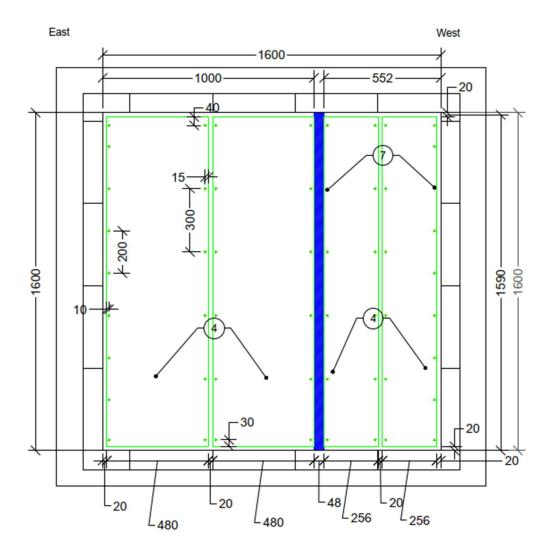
Elevation view of the second layer of plaster board (exposed side)
